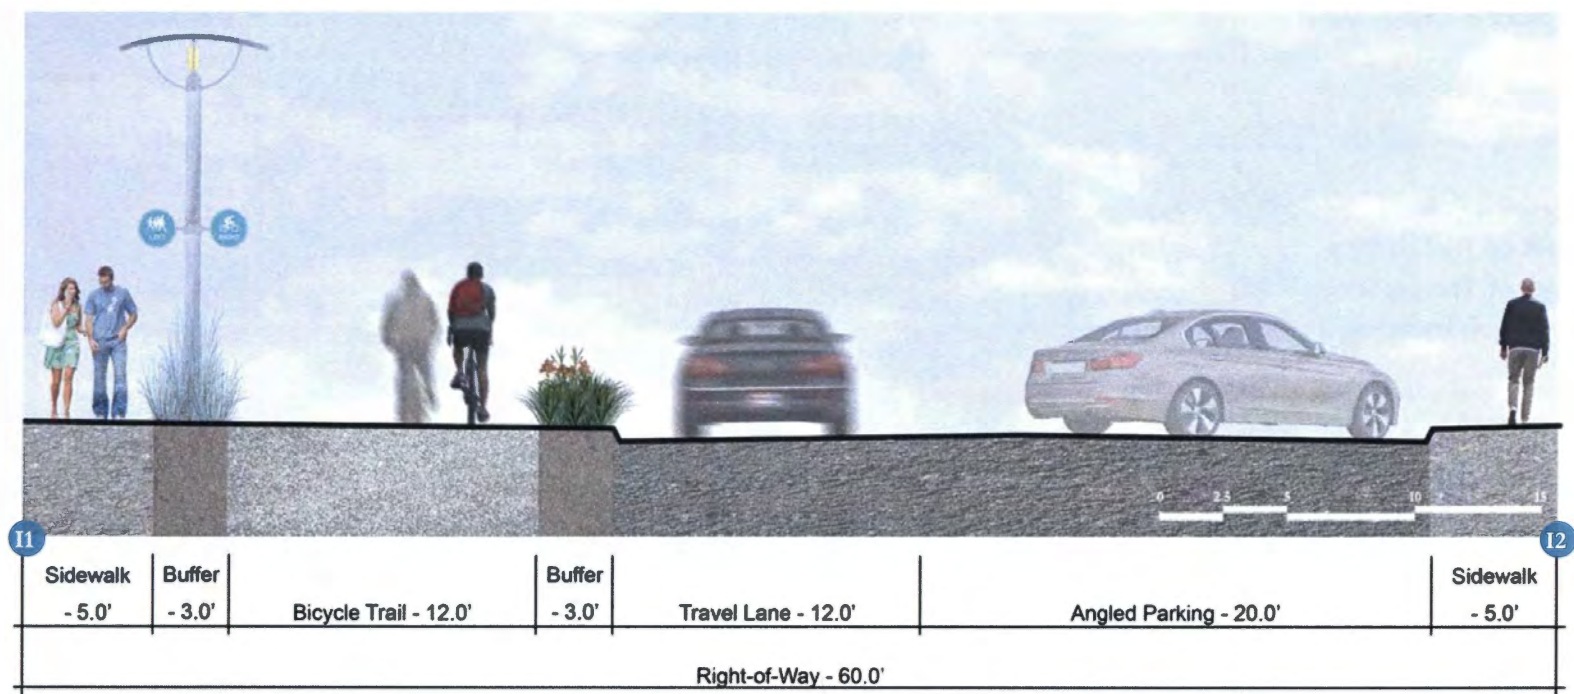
East 22nd Street between Chester Ave and Payne Ave Proposed Section
